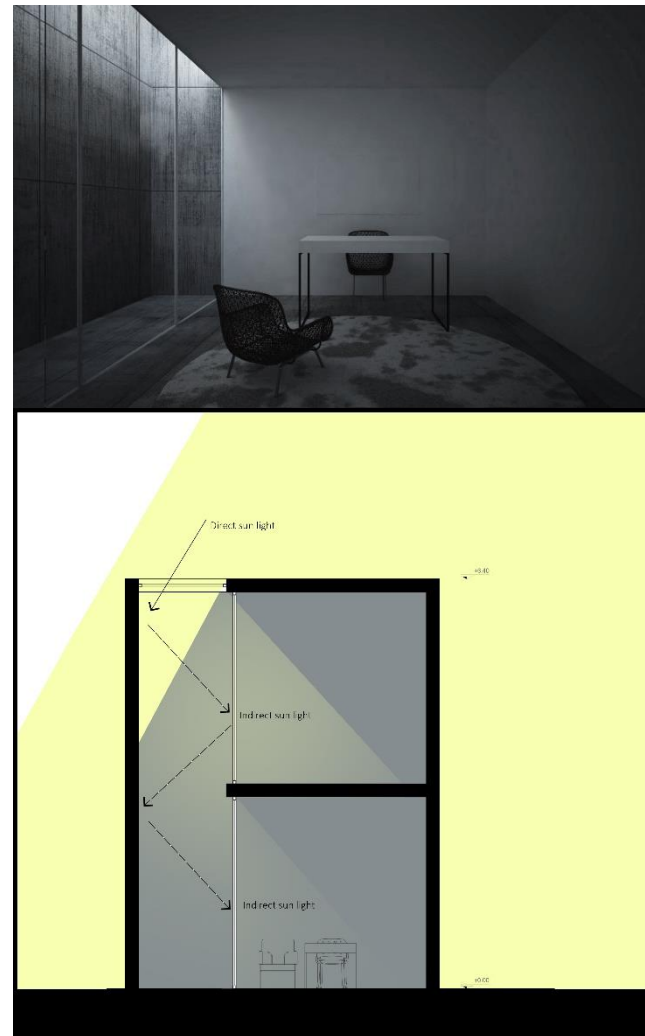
multi-store Ceiling opening and reflected day light render and draft
